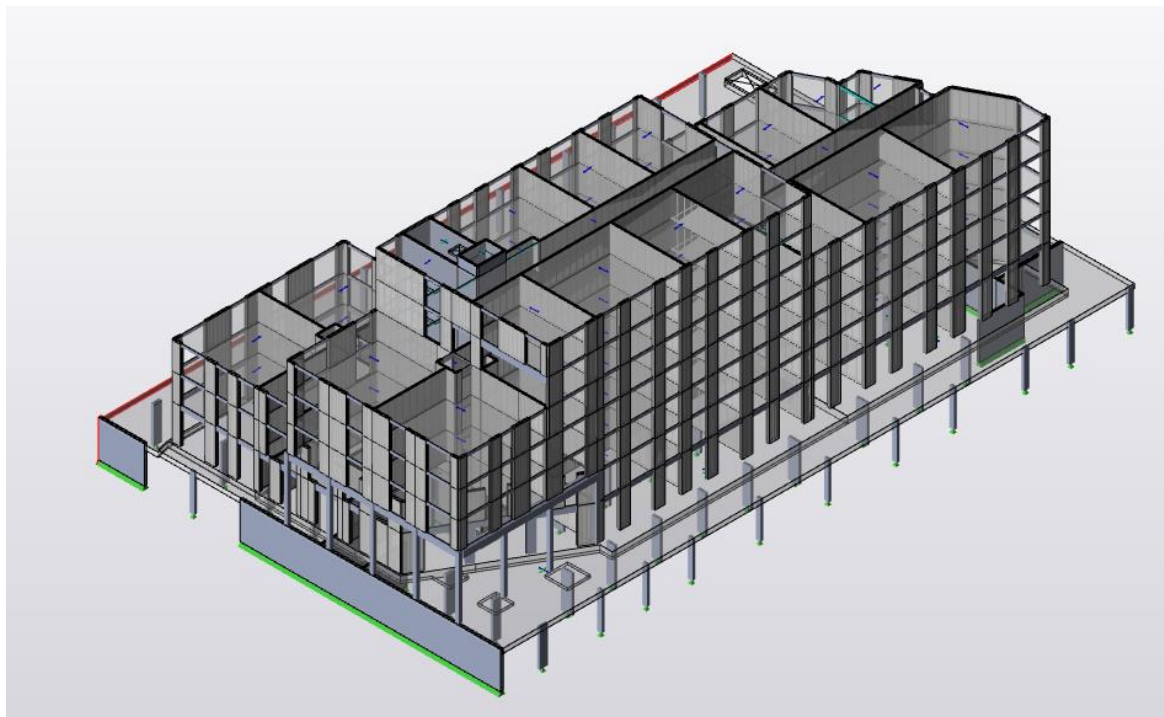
Blocks B precast slabs on masonry / RC cross wall construction above ground / podium level transfer slab (view from southeast).
